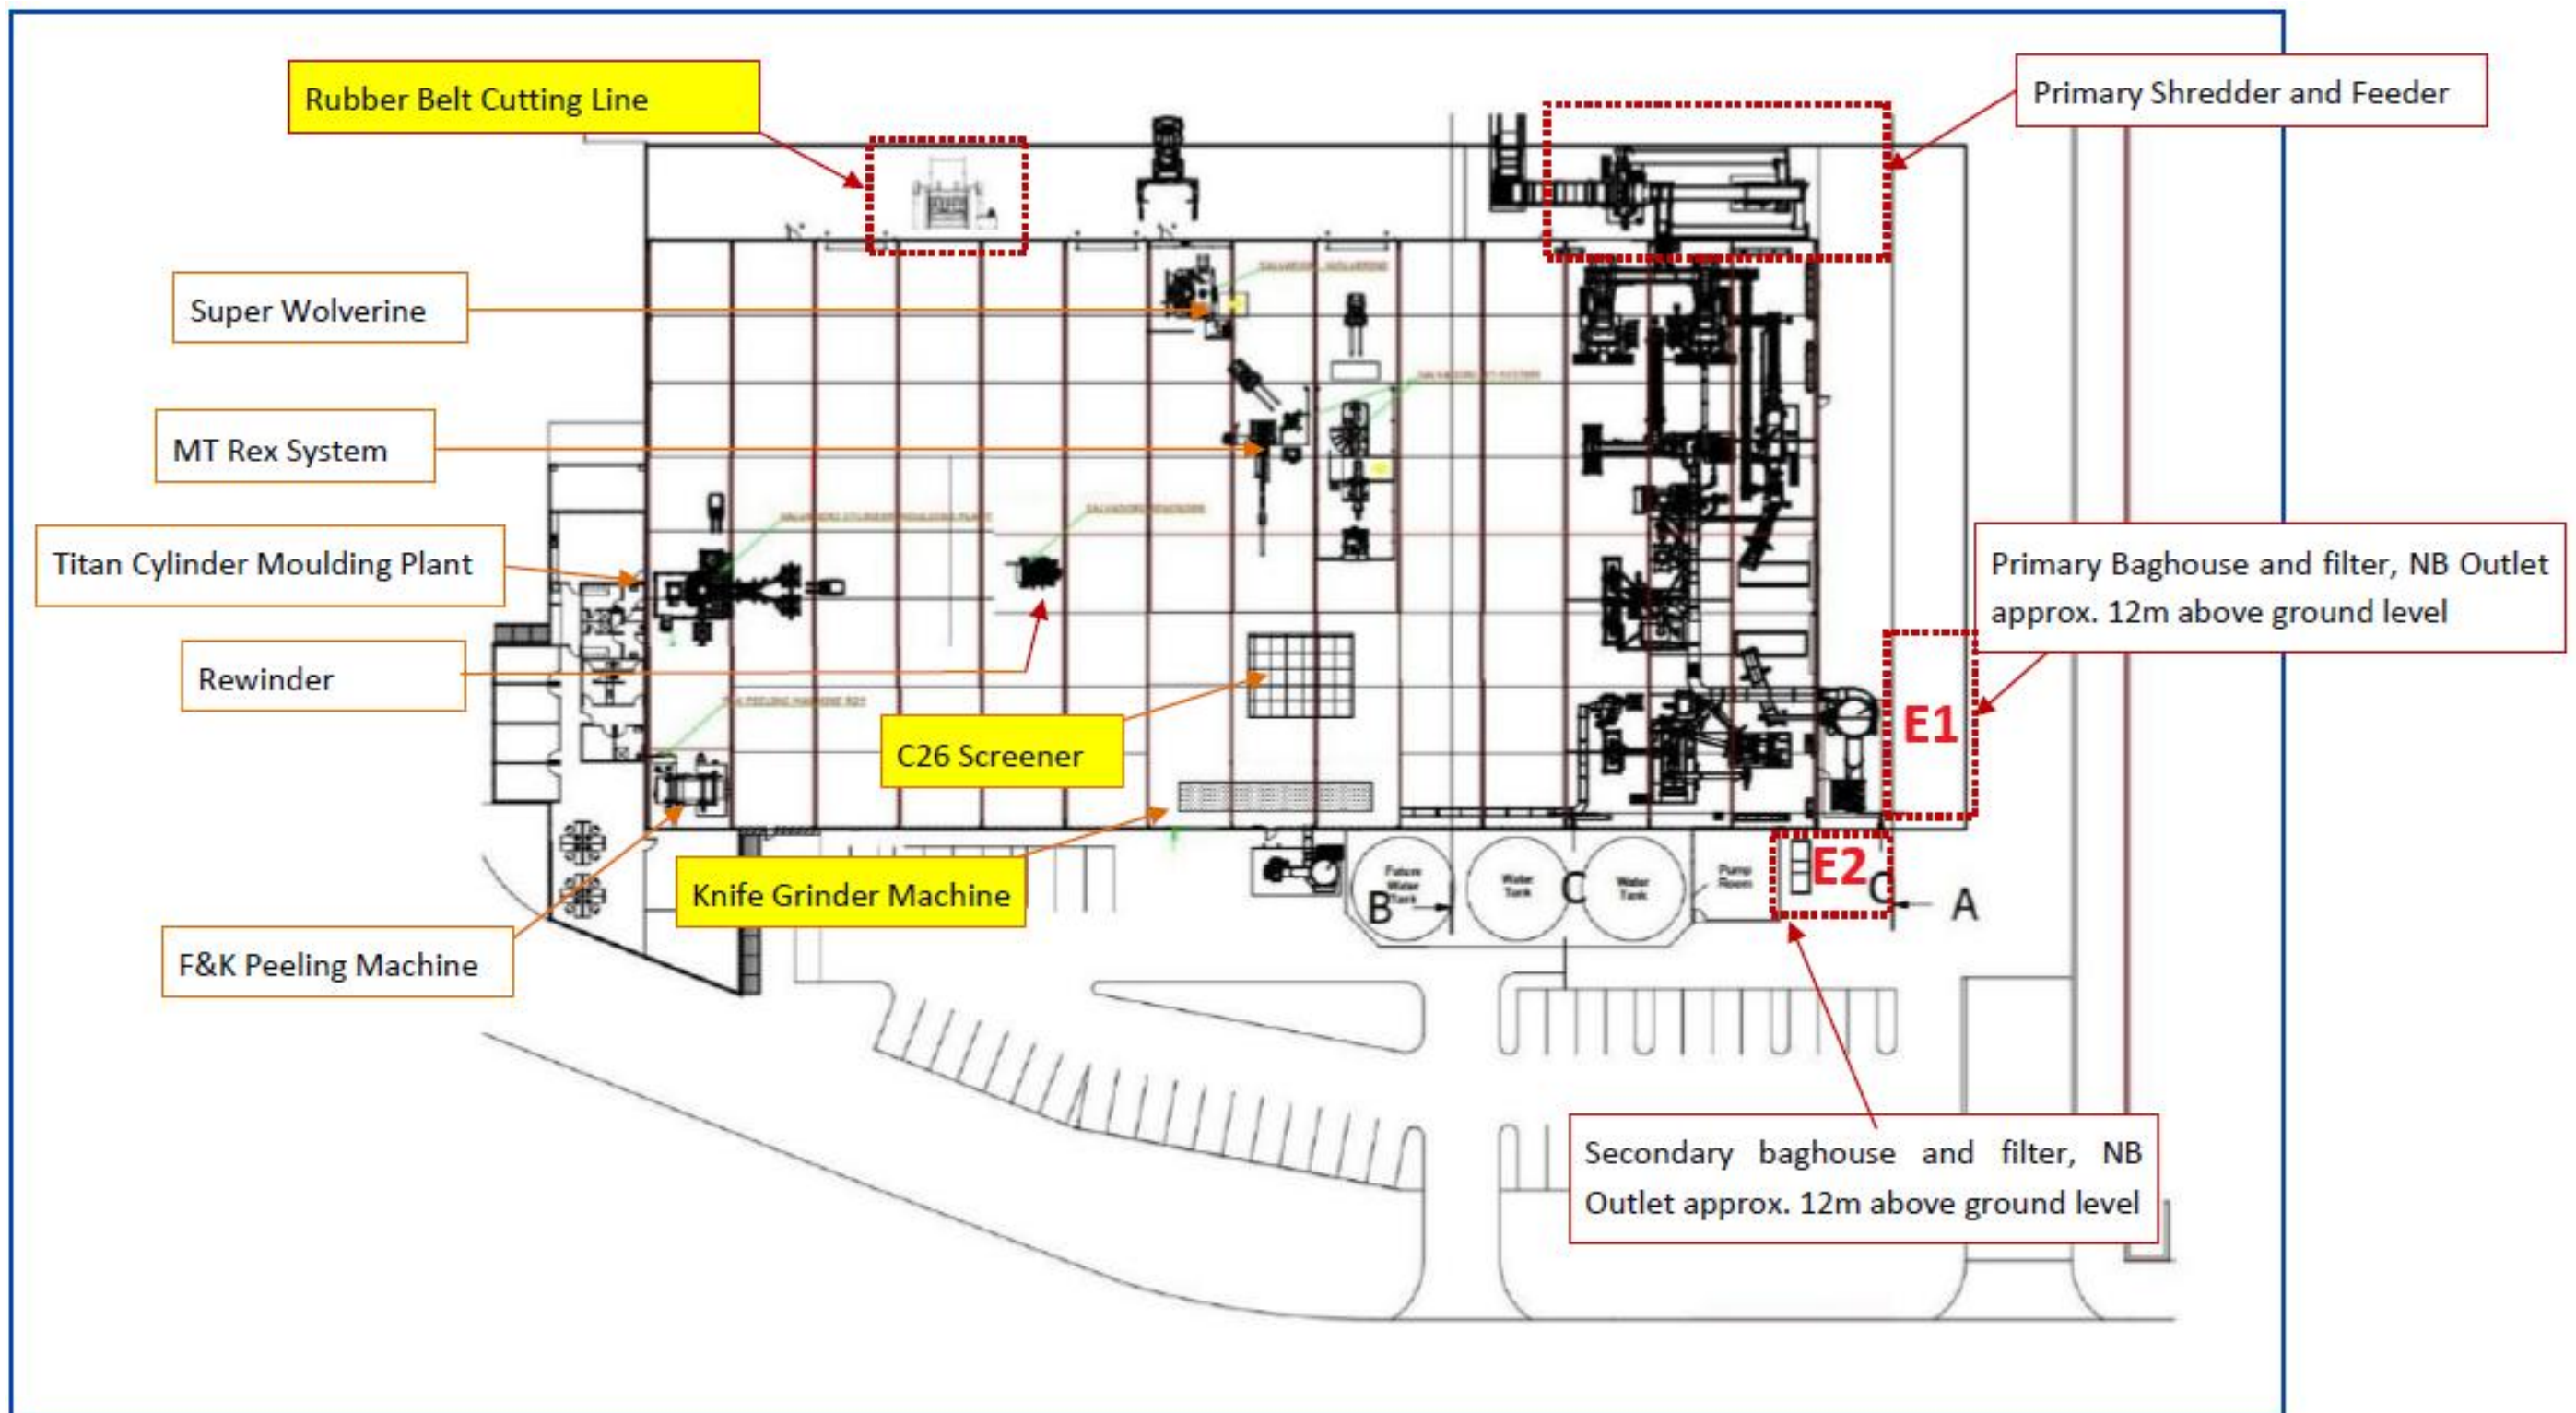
Proposed additional infrastructure and air emission monitoring point plan
